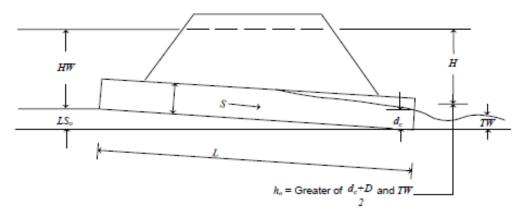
Determination of Adopted Tailwater (h<sub>o</sub>) [Source: Road Drainage, 2010].
